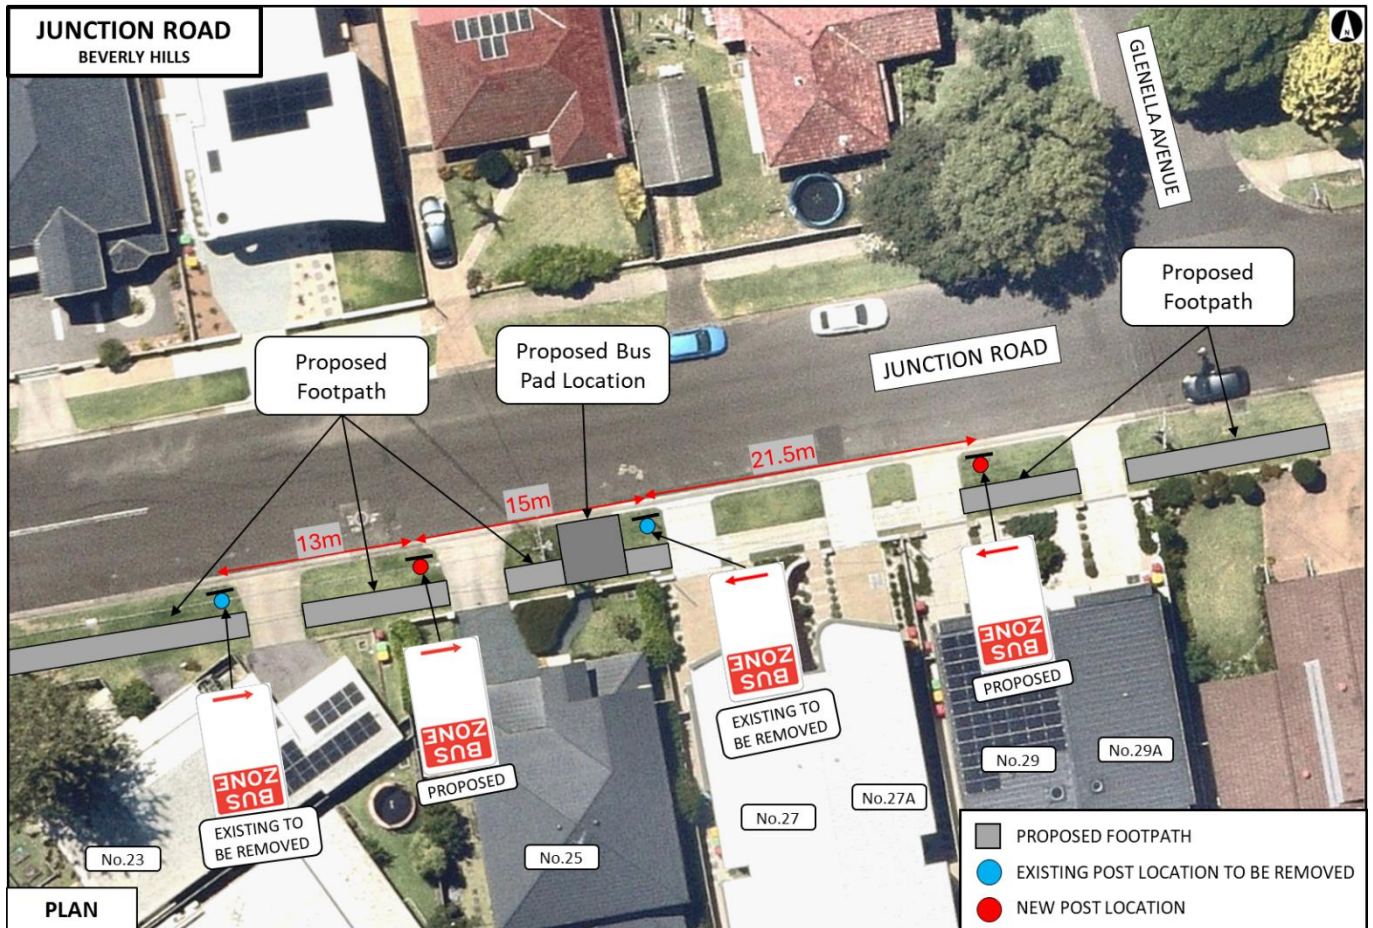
Plan of proposed relocation of 'Bus Zone' parking restriction.
